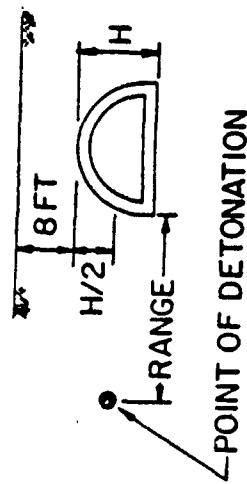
WALL DESIGNS FOR CIRCULAR SECTION.
